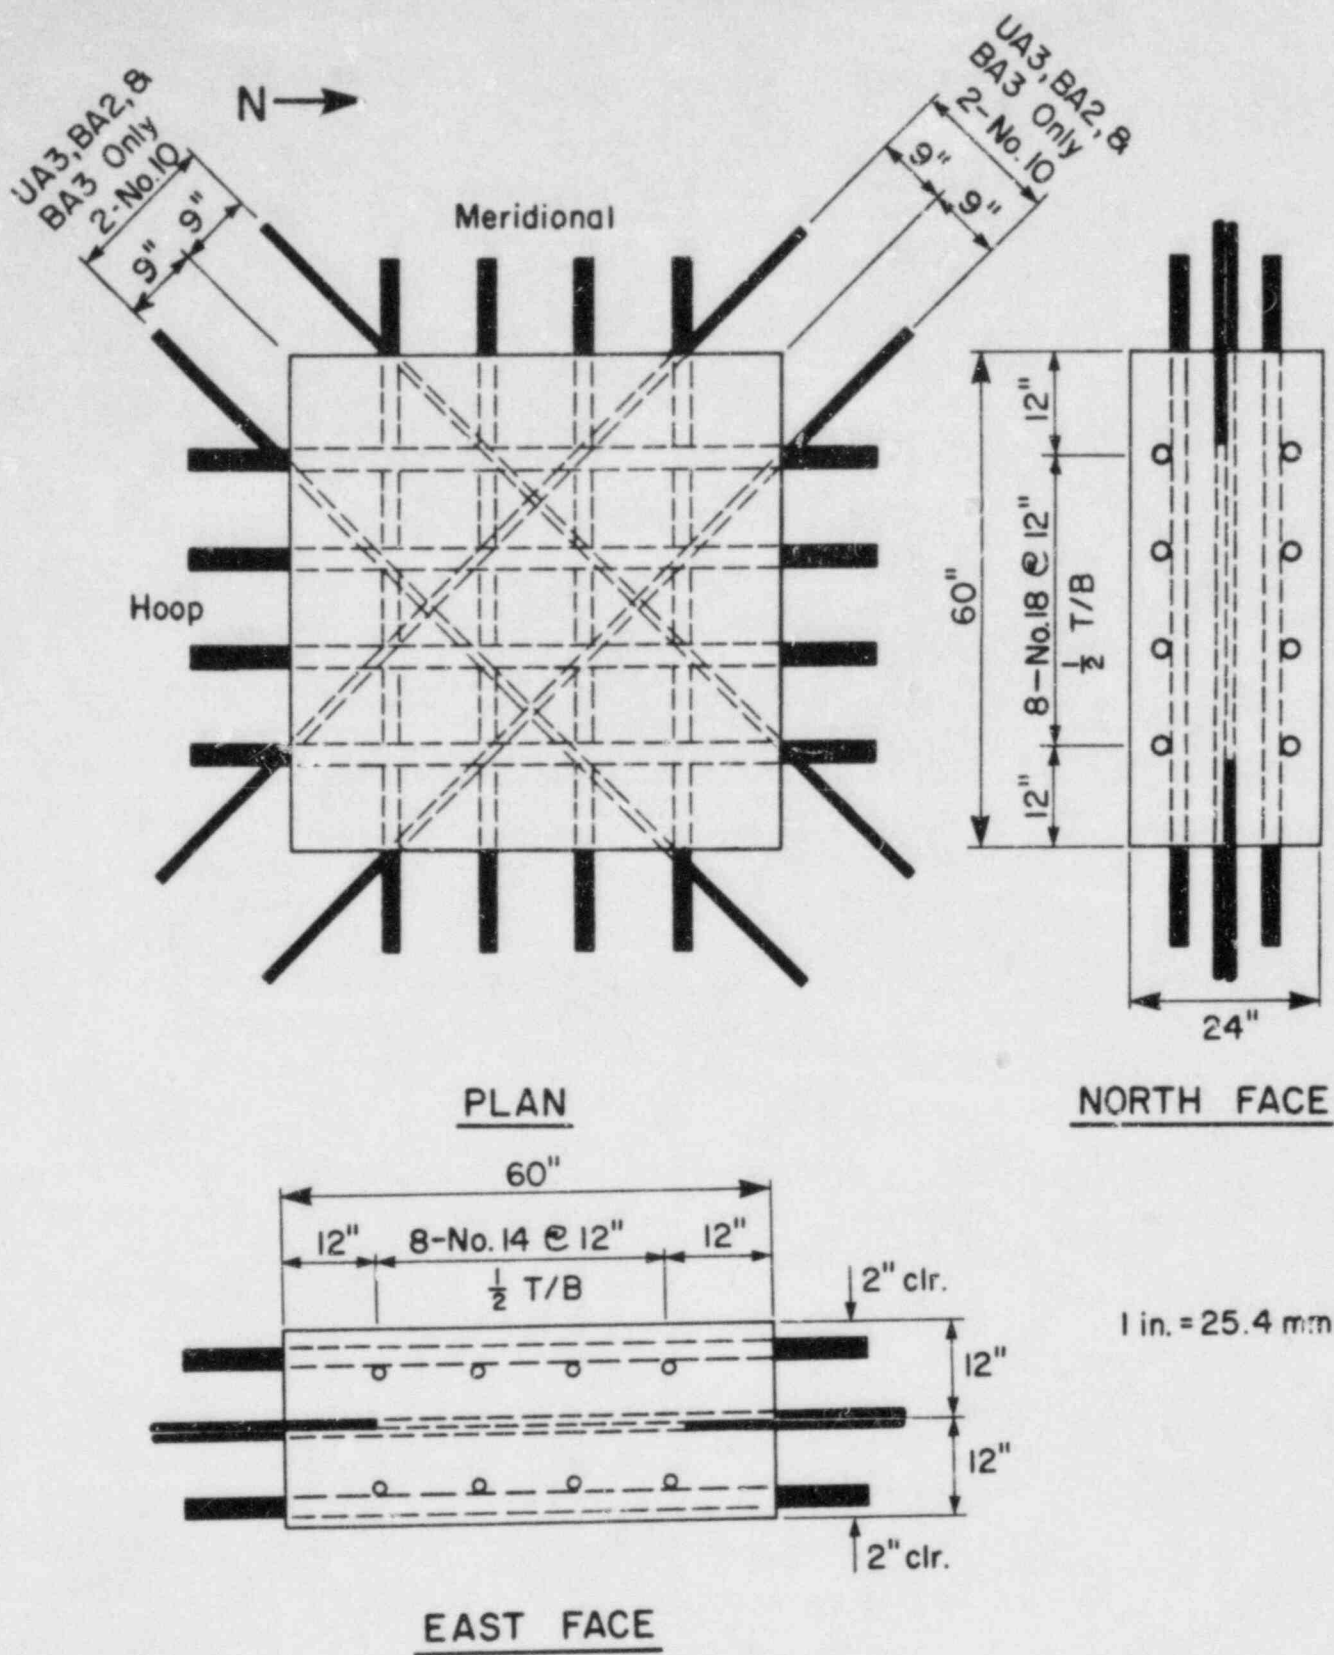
Reinforcement Details For Specimens UA3, BA1, BA2, and BA3
